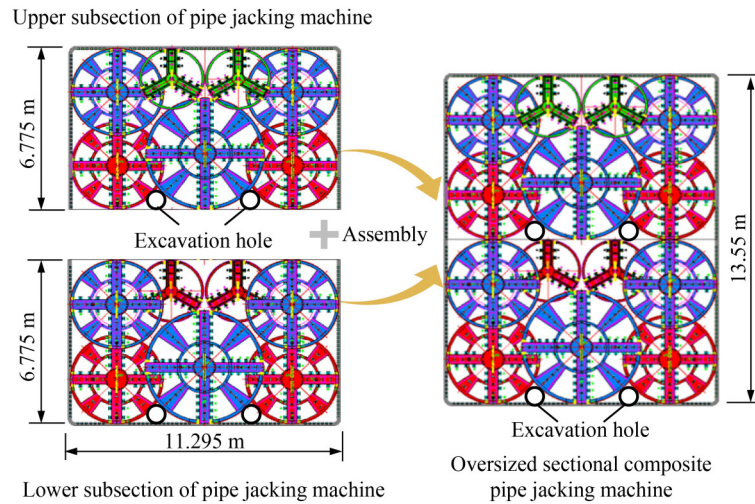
Assembly scheme for the large cross-section modular rectangular pipe jacking machine.
